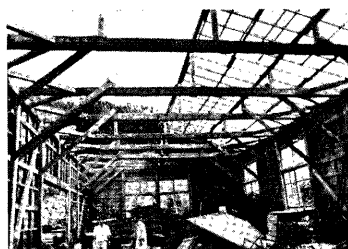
Roof failure due to uplift: warehouse.
